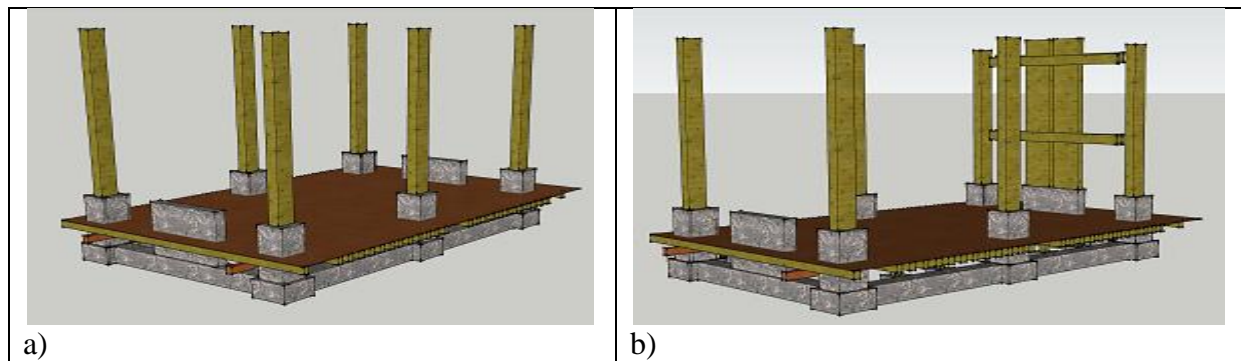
(a) Erect Columns (full height) and (b) Install east side end frame (walls and edge beams)
